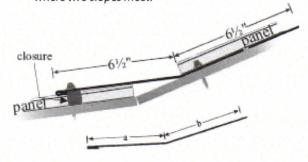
The transition flashing provides a continuous drainage where two slopes meet.
